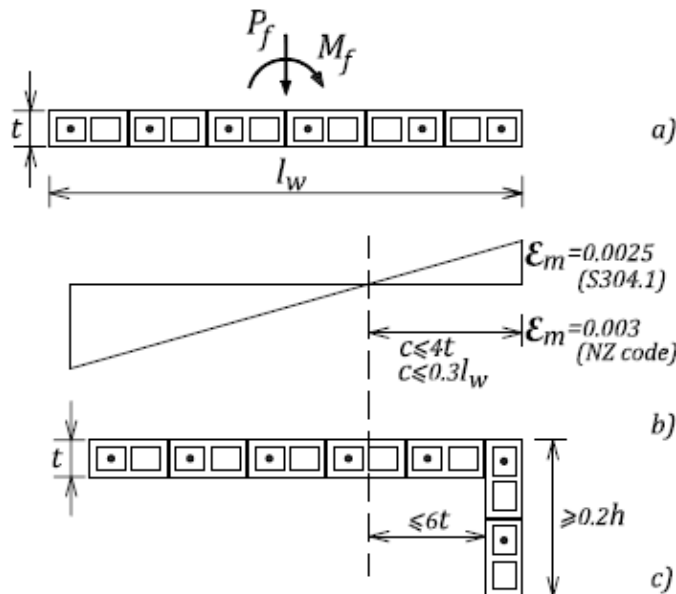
Neutral axis depth in ductile shear walls: a) rectangular (non-flanged) wall cross-section; b) corresponding neutral axis depth limits; c) flanged wall.
